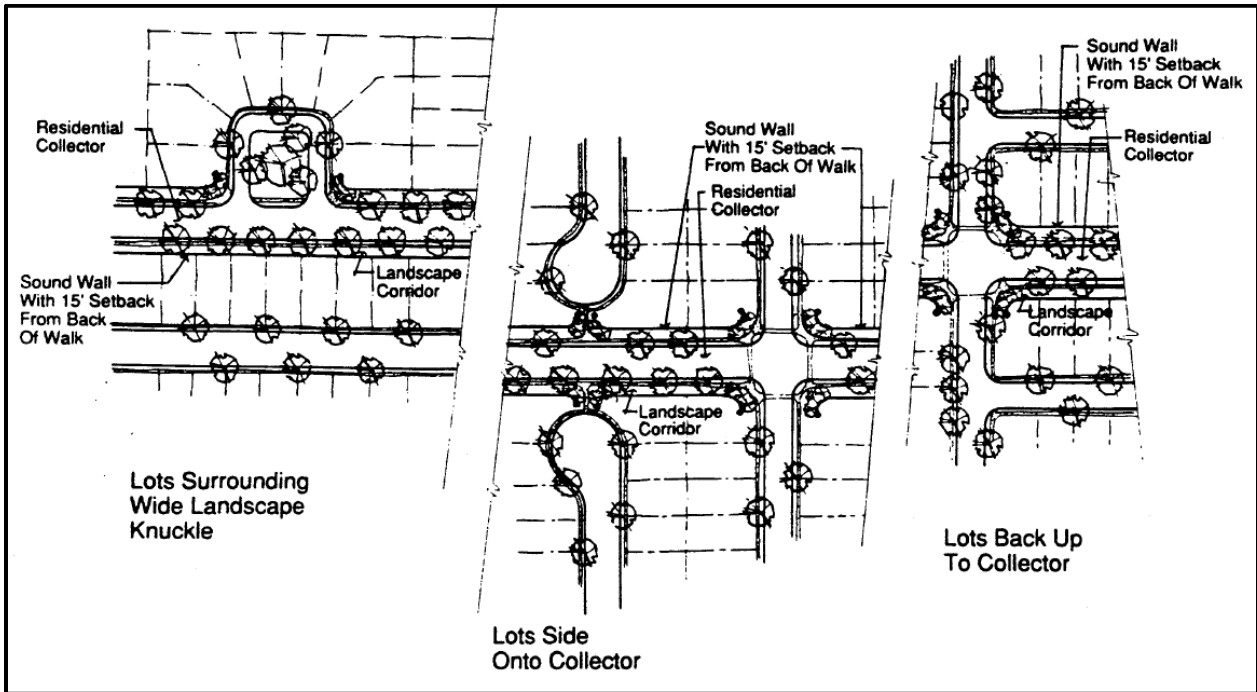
Alternative Site Plans Adjacent to Residential Collector Streets
